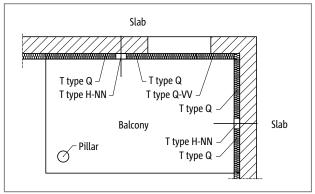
Schöck Isokorb® T type H: Balcony supported on two sides with column
